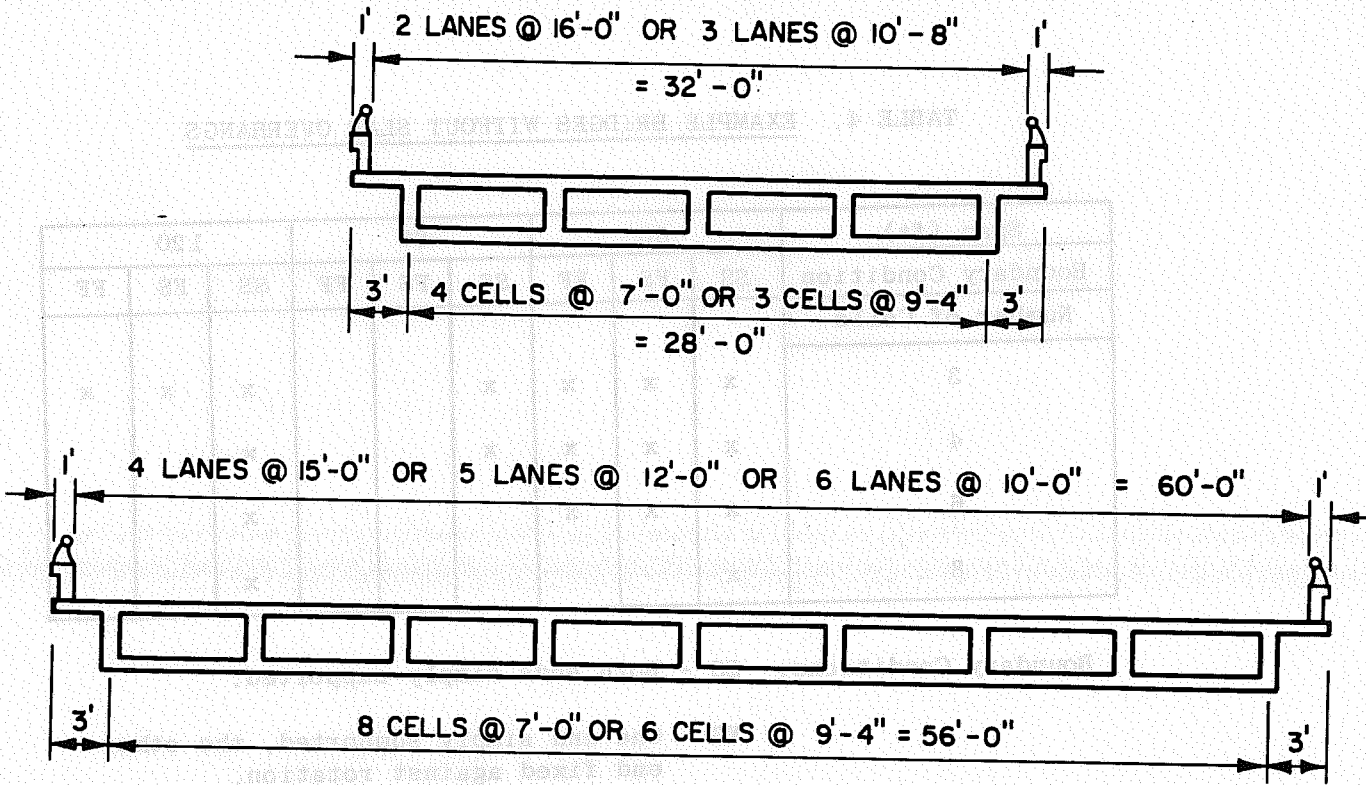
LANE SUBDIVISIONS OF EXAMPLE BRIDGES
